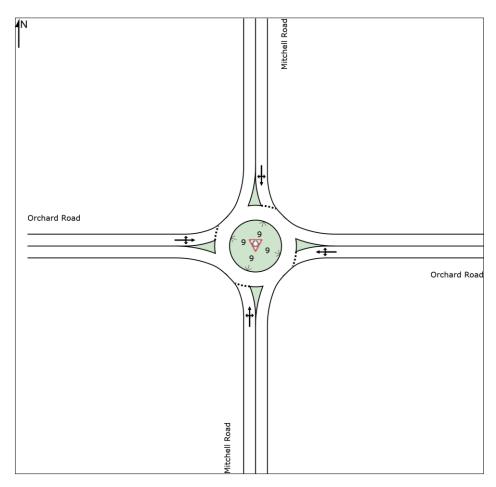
Roundabout Intersection Layout of Mitchell Road with Orchard Road (SIDRA)
